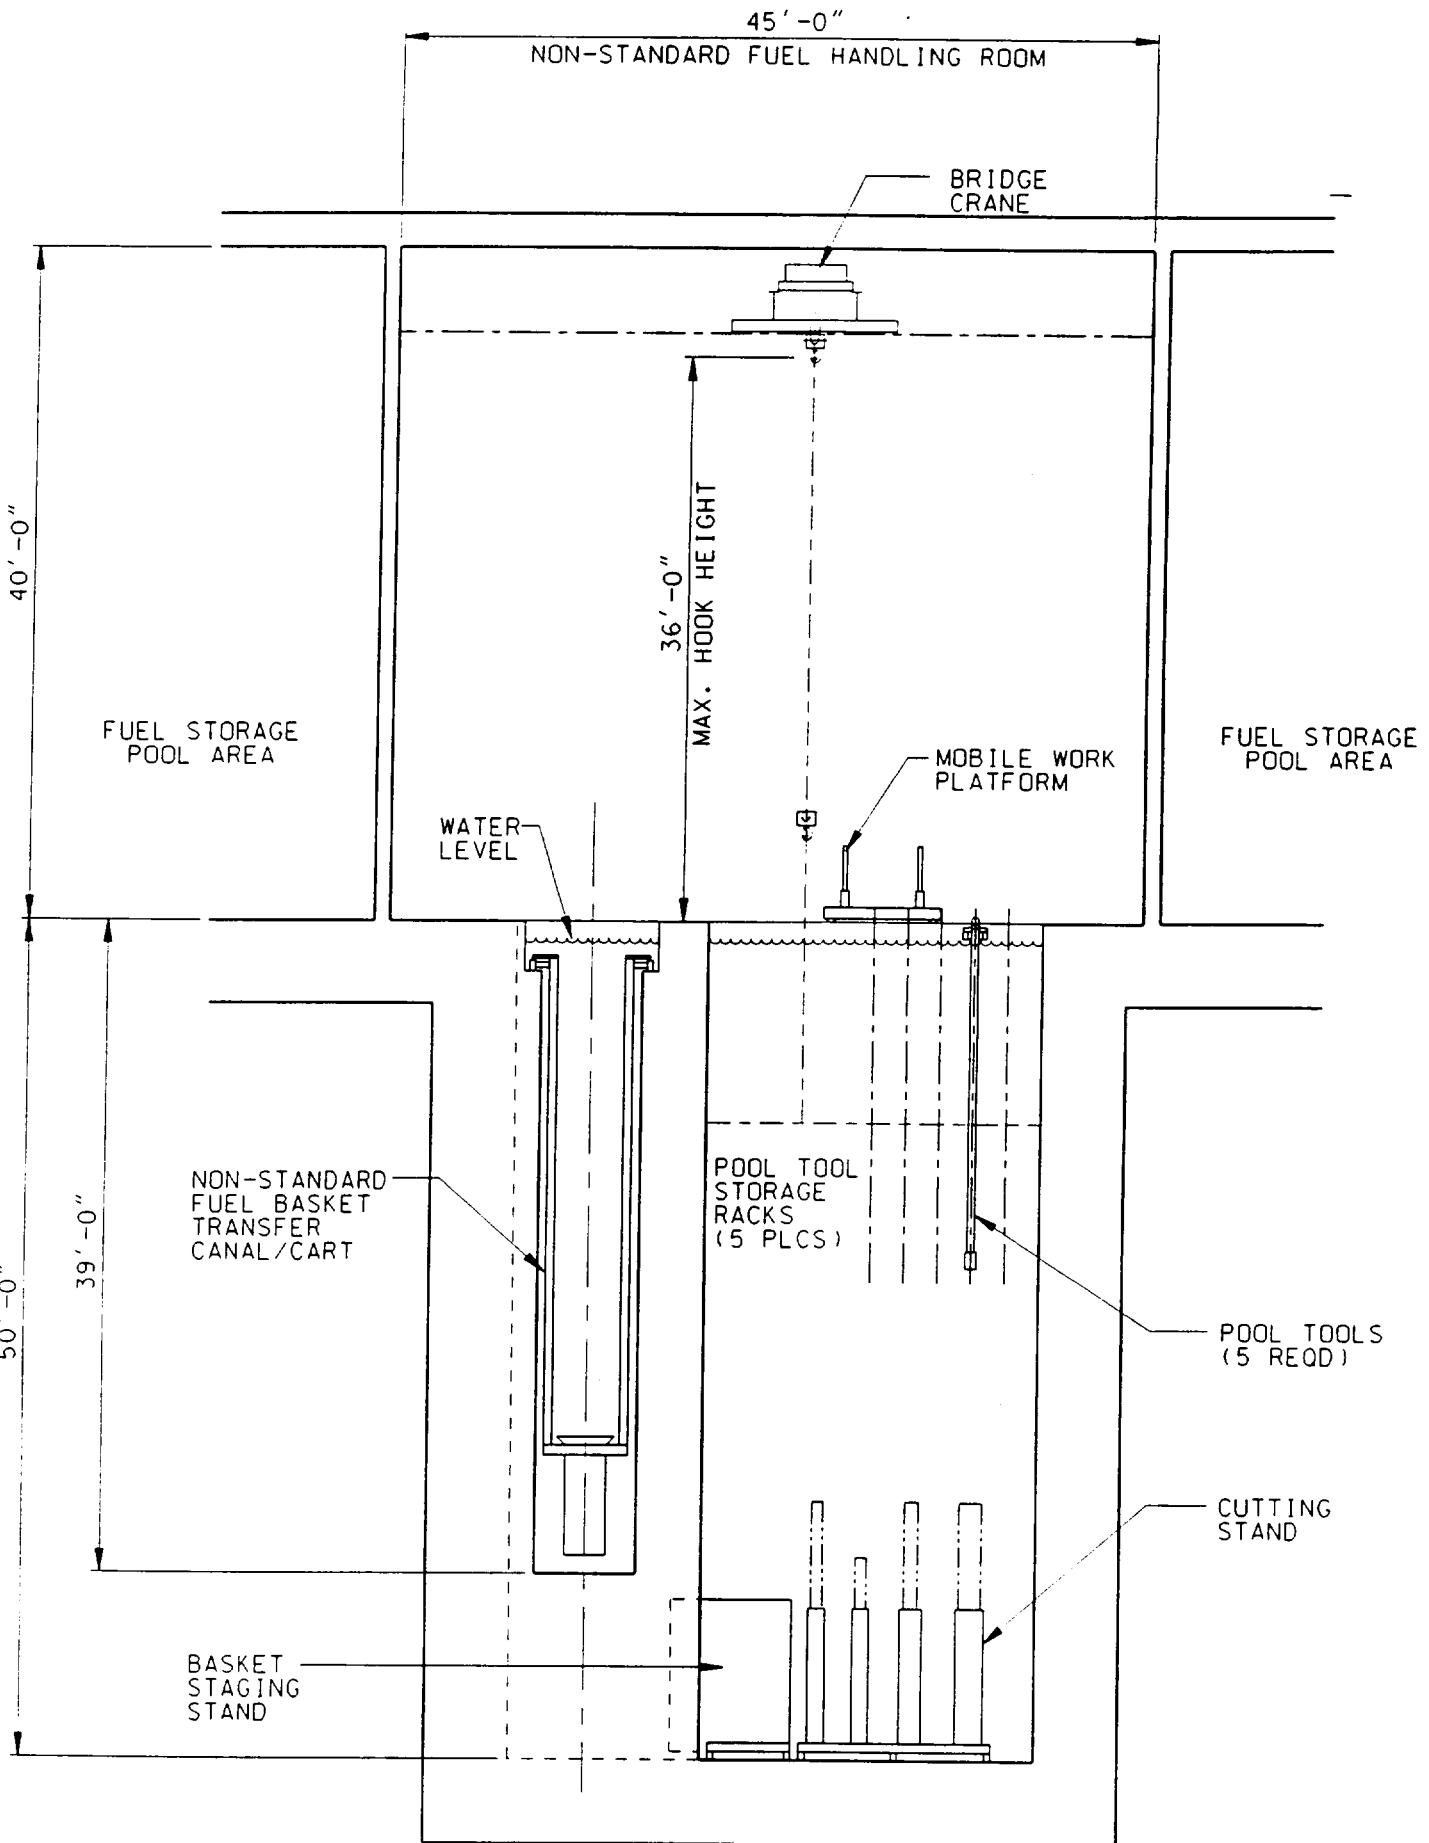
Non-Standard Fuel Handling Room Section
